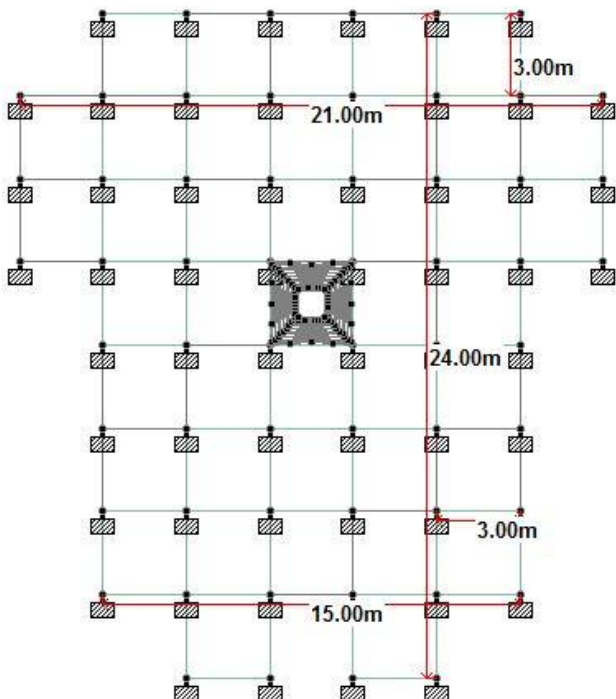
Case D of Telecommunication Tower over Roof (Plan-Position P4)
